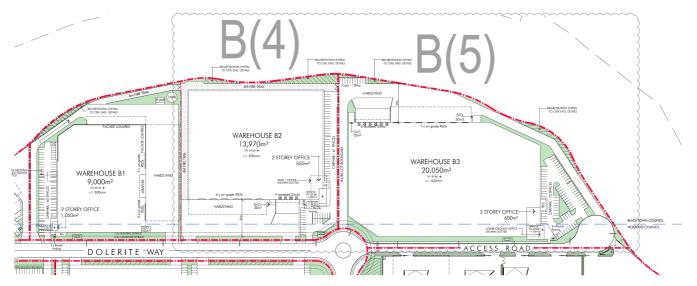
QuarryWEST Precinct B Site Plan - As Currently Approved
